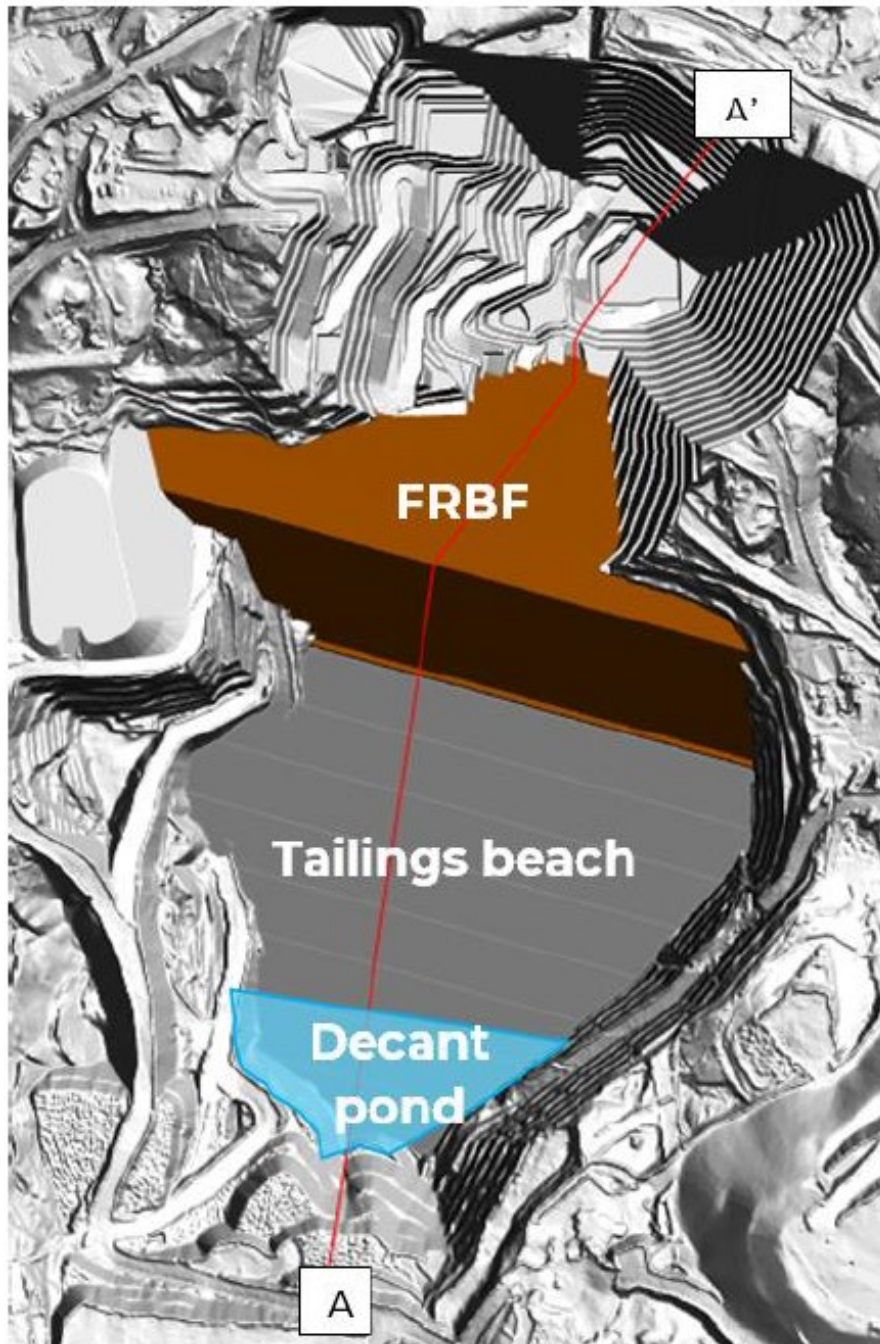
FRBF, the tailings beach, and decant pond. Source: RM24.184 application.
